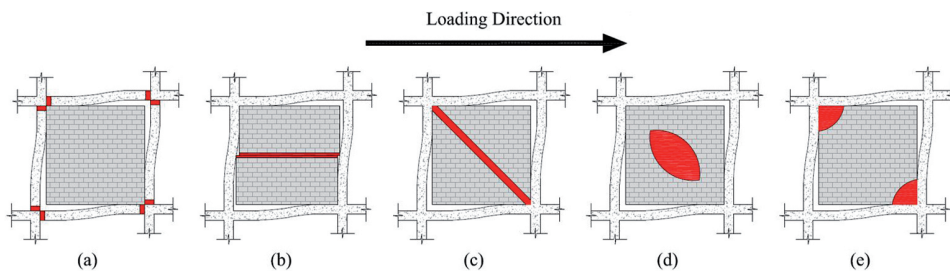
Common infilled system failure mechanisms; frame damage (a), horizontal shear (b), diagonal crack (c), mid-height diagonal compression (d) and corner crushing (e)
